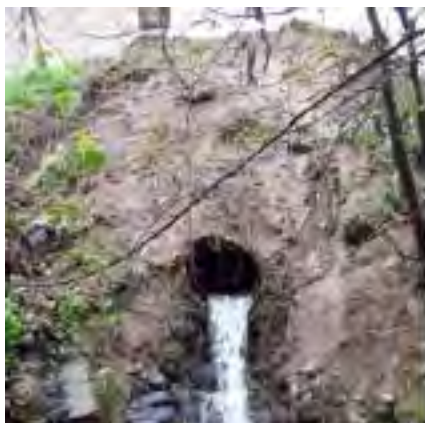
Outlet No.7 – Recipient Channel going to River Dragor near Concrete Base Stenton
